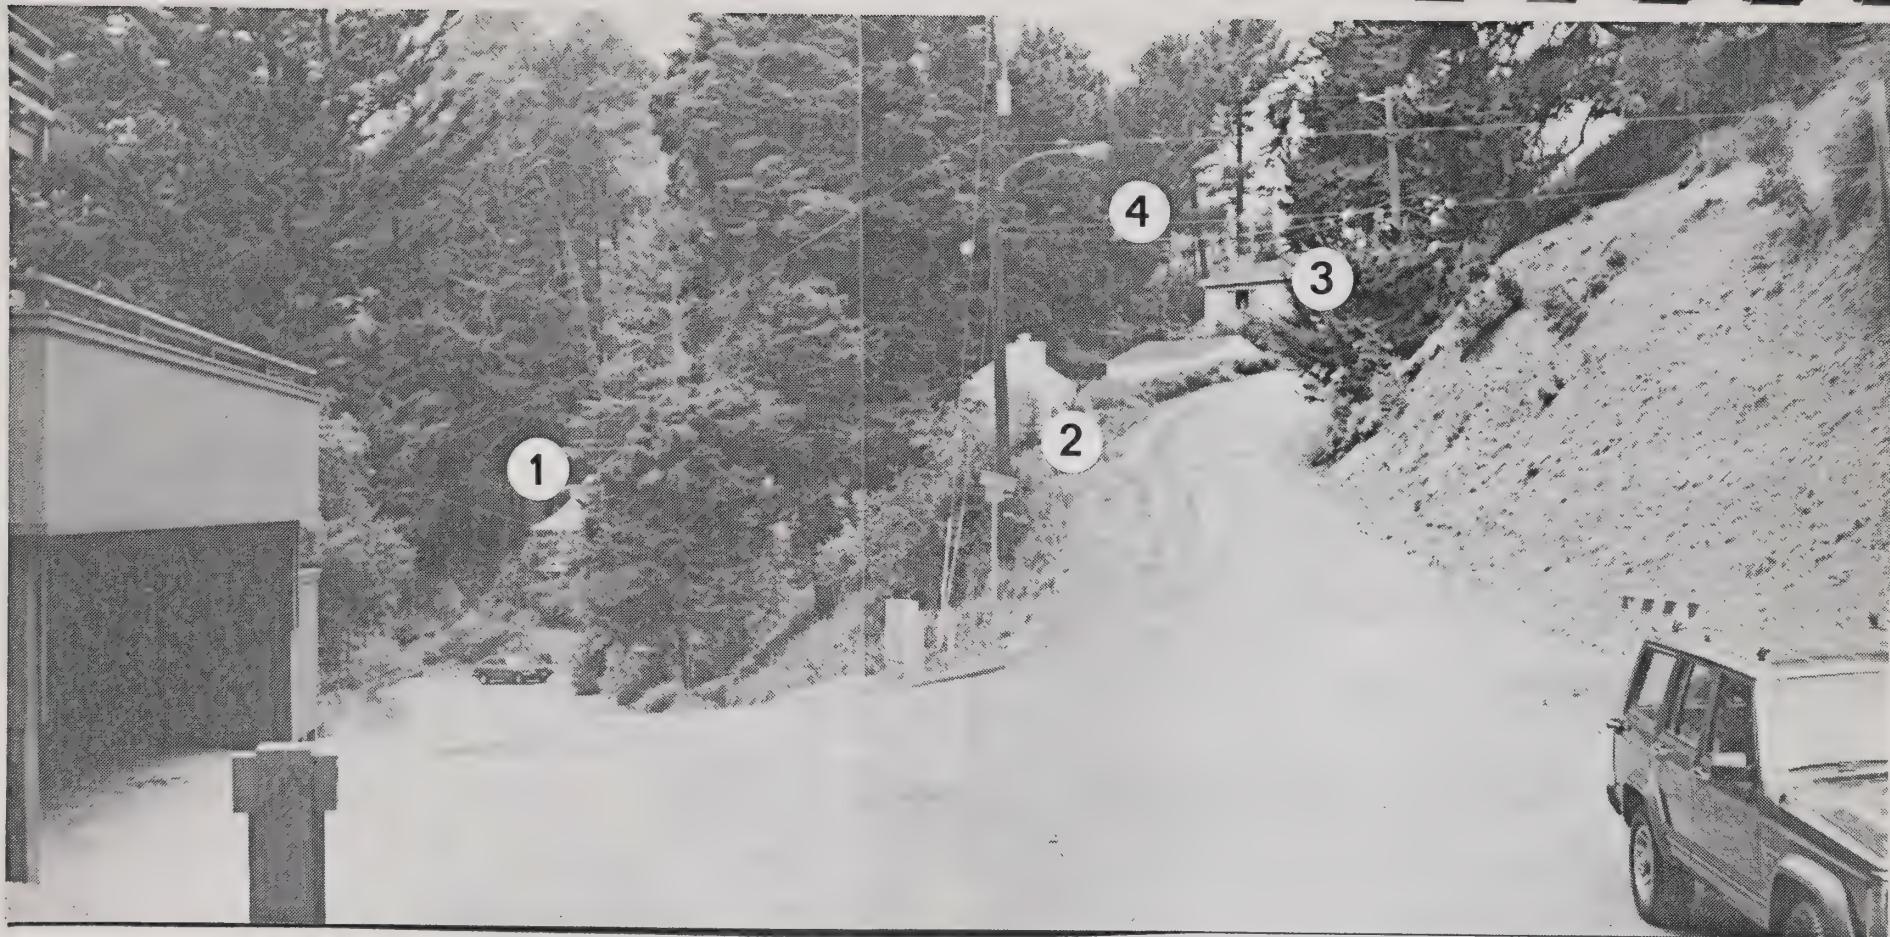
View looking northwest from the project-site entrance toward Keswick Court (left) and Beaconsfield Place (right). The garage of 2639 Beaconsfield Place is at the far left. Dark strips on Beaconsfield Place are a utility-trench patch and, closer to the outside edge of the road, sealed roadway cracks (also apparent in Fig. 30). The roadway cracking indicates possible problems with settlement of fill. Through the curve, Beaconsfield has width of about 18 feet. Widening might be difficult because of the steep upslope embankment. Almost all of the trees in this photograph provide screening of the project site from portions of Keswick and Chatsworth Courts. 1: Portion of front porch of house on north side of end of Keswick Court. A relatively small part of the northwest corner of the site is visible from this part of the house. 2: House on Beaconsfield Place, on lot at inside corner of Beaconsfield/Keswick (garage is just above, to the right, with access from Beaconsfield). This house has east-facing windows with partially-screened view of project site, including portions of north slope and canyon floor, and east-end tree grove. 3: House at 2605 Beaconsfield Place, at inside of Beaconsfield/Chatsworth intersection. This house has windows with views overlooking much of the project site, along the length of the canyon floor. 4: House at #21 Chatsworth Court, which has partially-screened view of portions of the project site.
